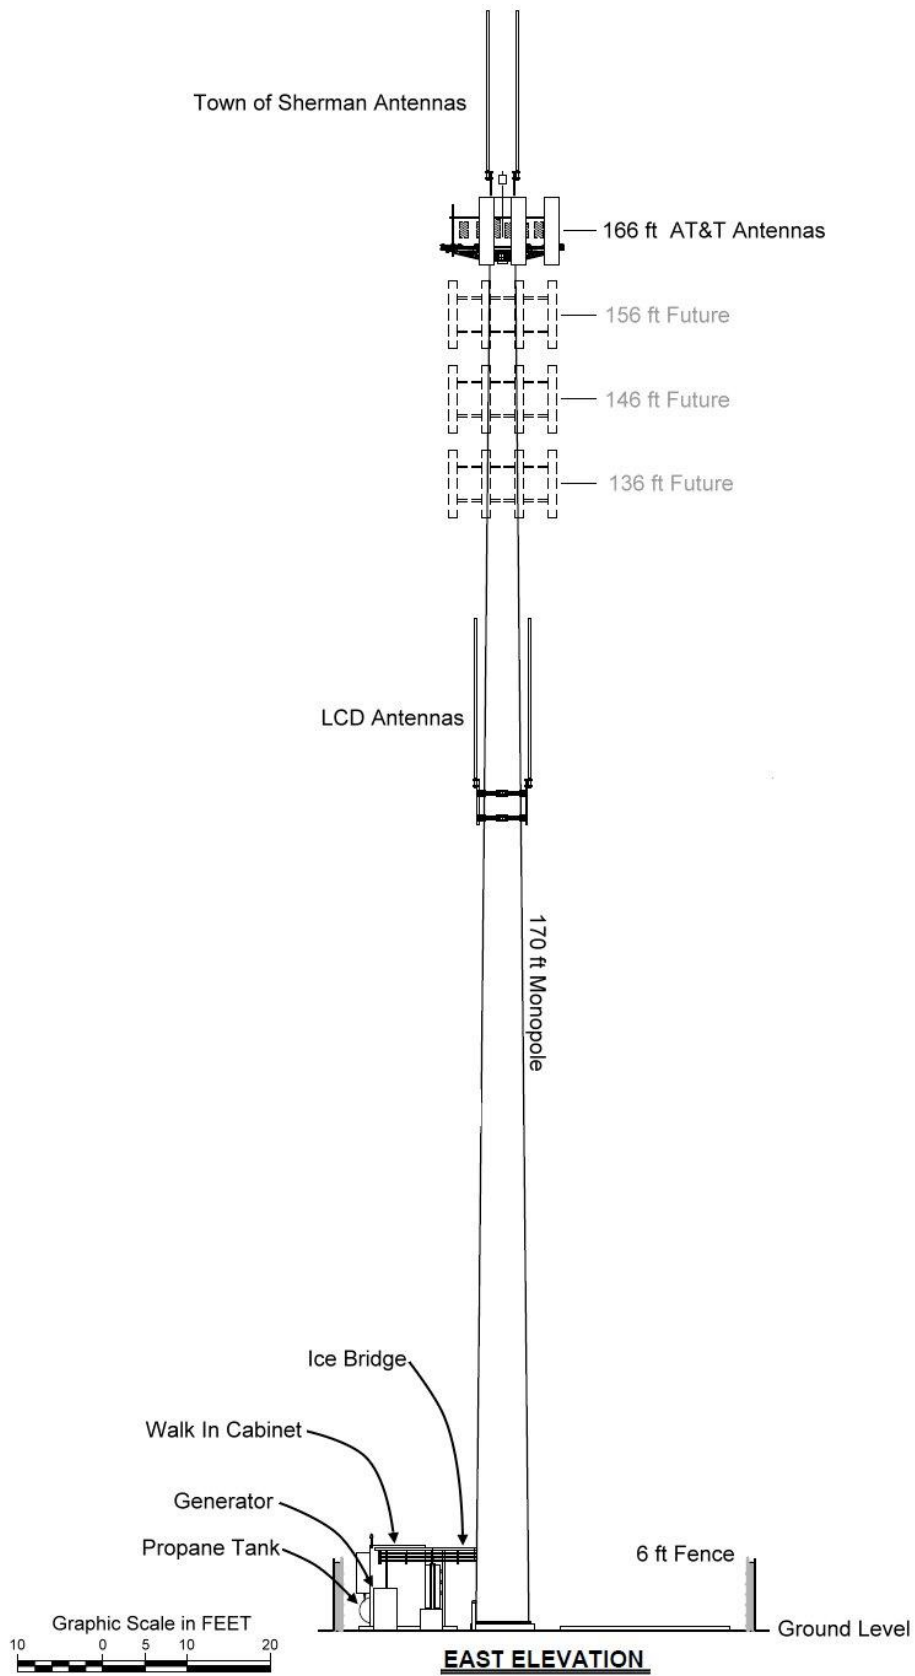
Plan Showing the Proposed Elevation Character of the Project
